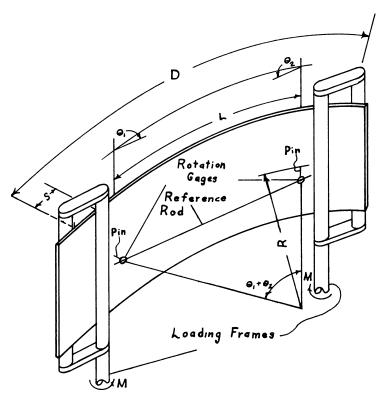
Pure Bending Test Showing Angular Rotation Gages and Loading Frames
